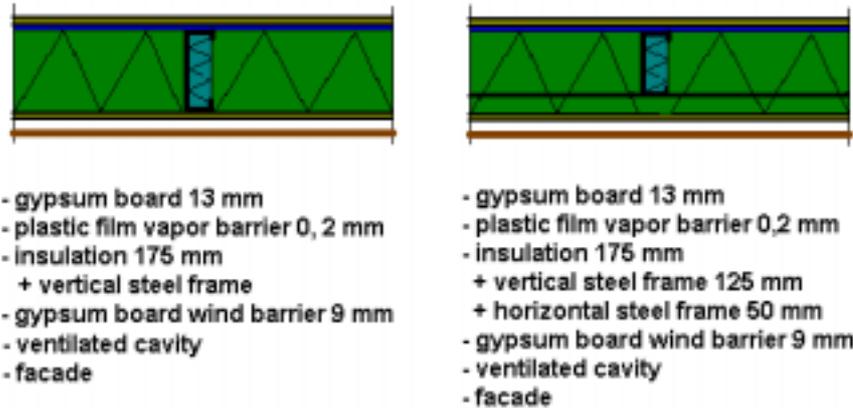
Single and double framed wall structures used as exterior wall in Finland.
